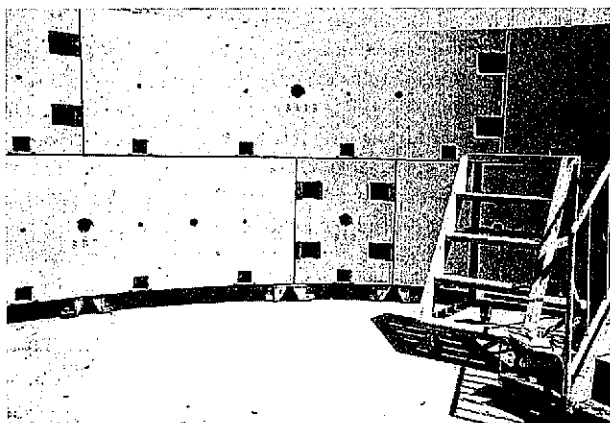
Application example of insert-type high-stiffness joints in subway tunnel
